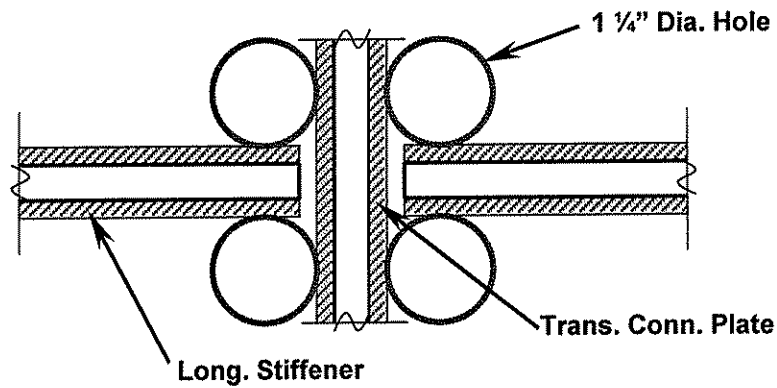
Potential retrofit at longitudinal stiffener weld termination at intersection with transverse connection plates
